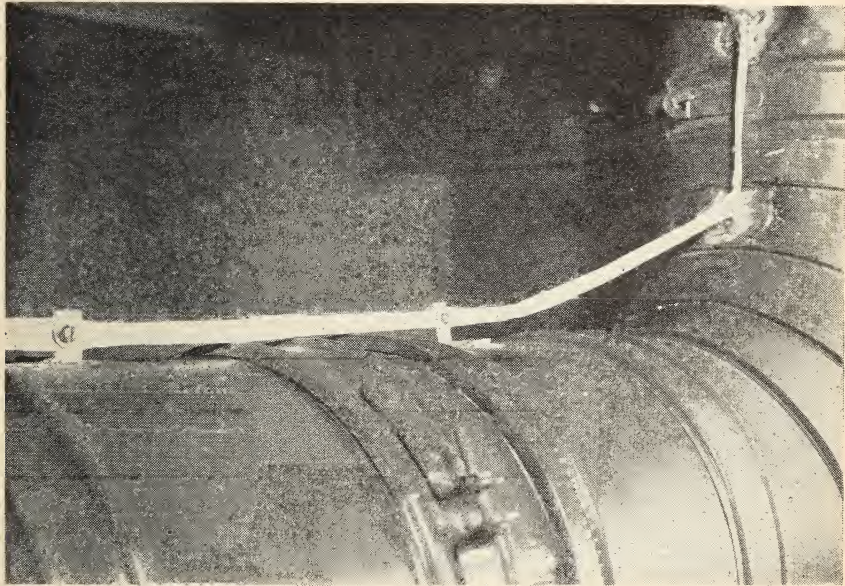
Electrical bonding cable attached to metal brackets welded to cotton-conveying metal piping.
